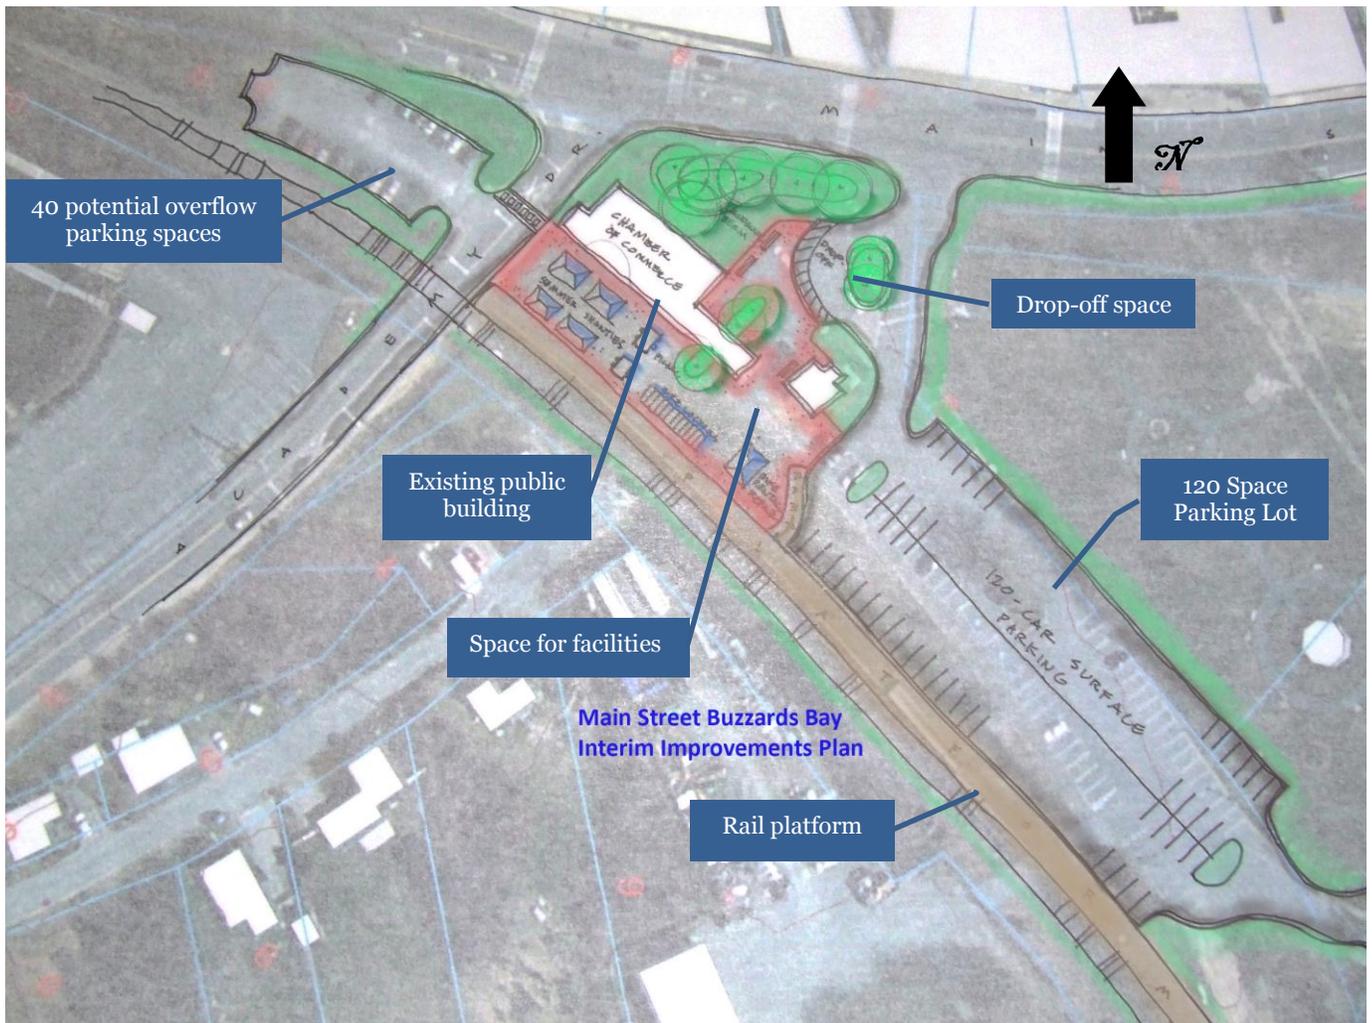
120 SPACE PARKING ALTERNATIVE
